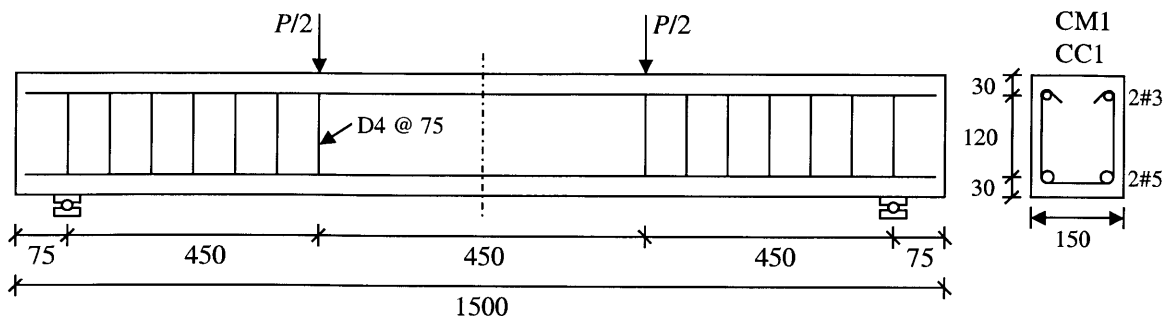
Geometric and reinforcement details of the control beam specimens (in mm)
